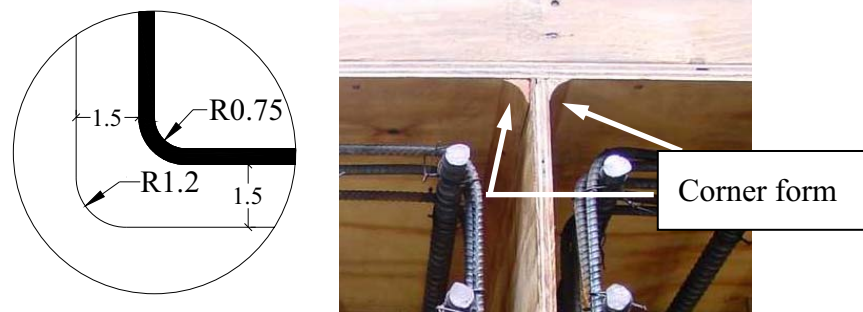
Chamfer Detail for the Corners of All Prismatic Specimens
